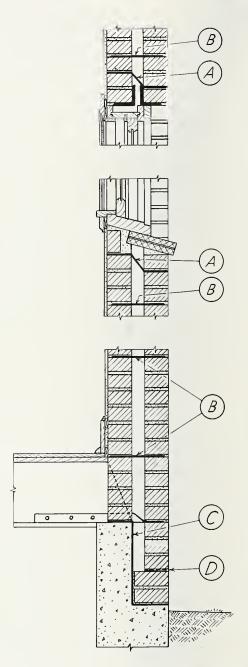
Flashing above and below windows, and dampproofing at bottom of cavity walls.
